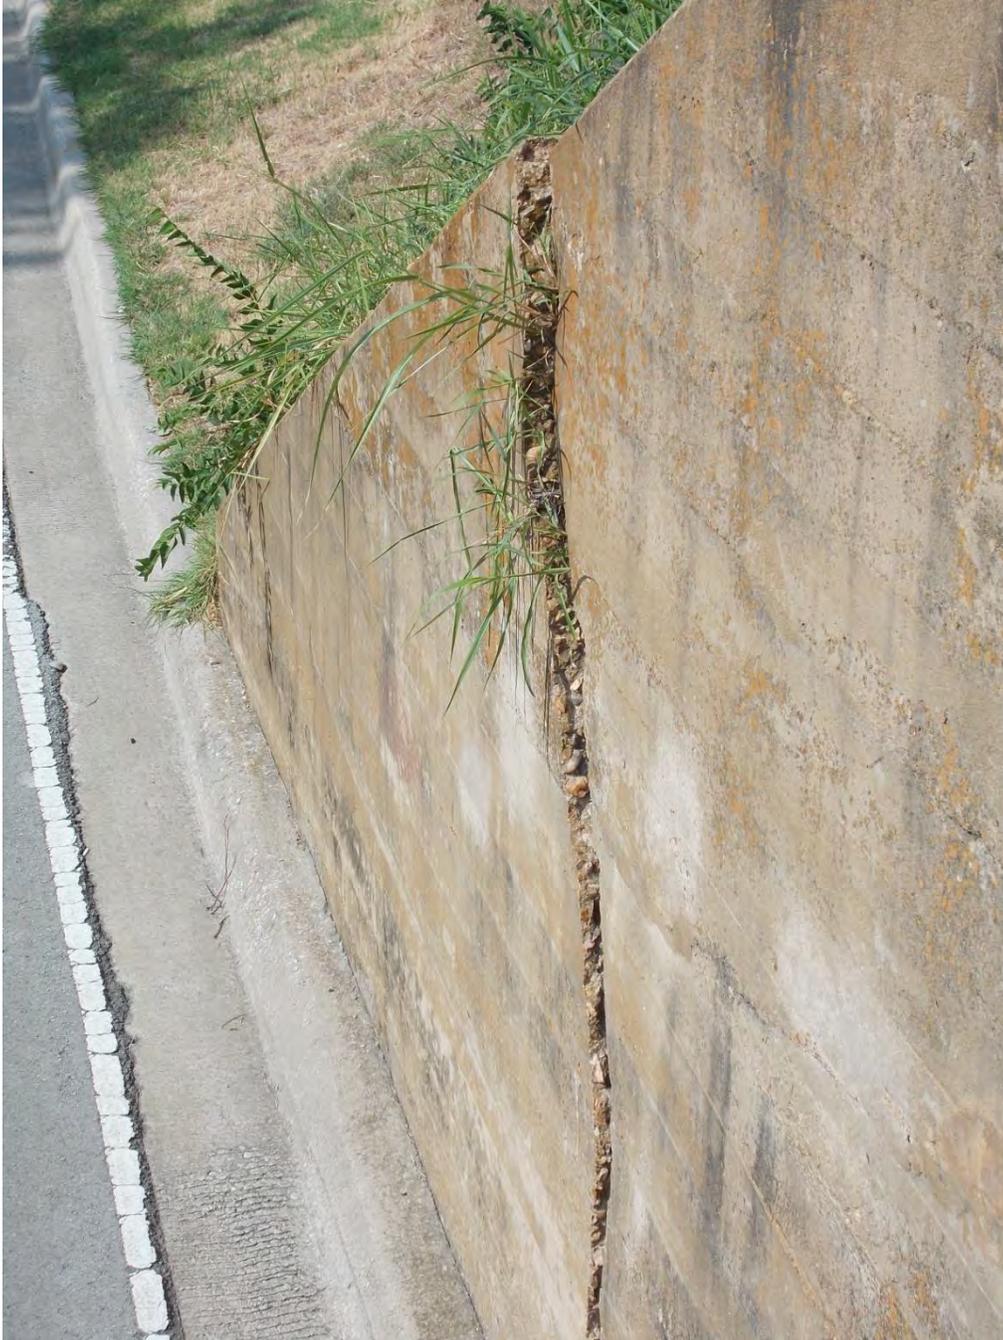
Full-Height Fracture in the Southwest Wingwall, Near Mid-Length
